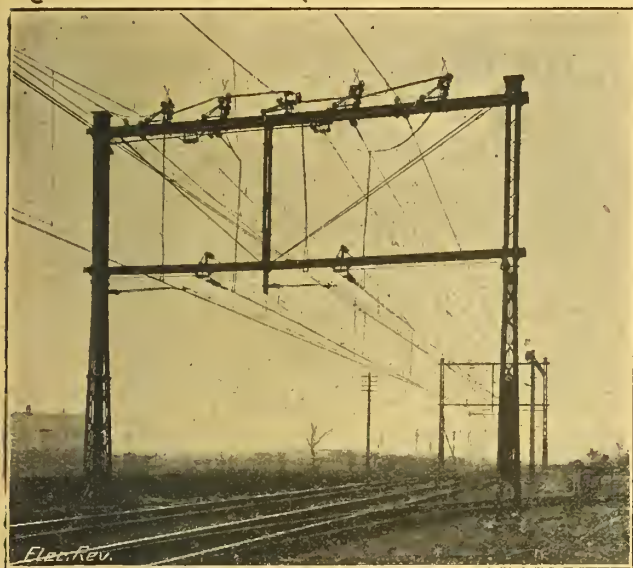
VIEW OF GANTRY WITH SECTION SWITCHES.
